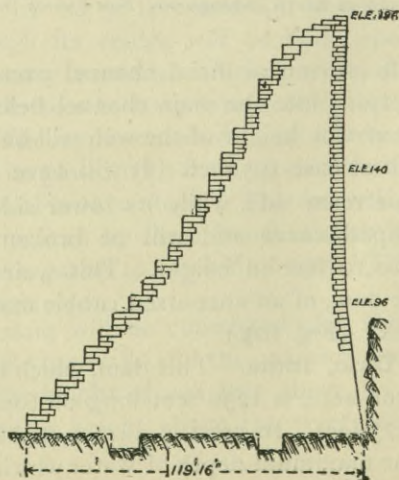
CROSS-SECTION OF OVERFALL WEIR, NEW CROTON DAM, CORNELL'S.
